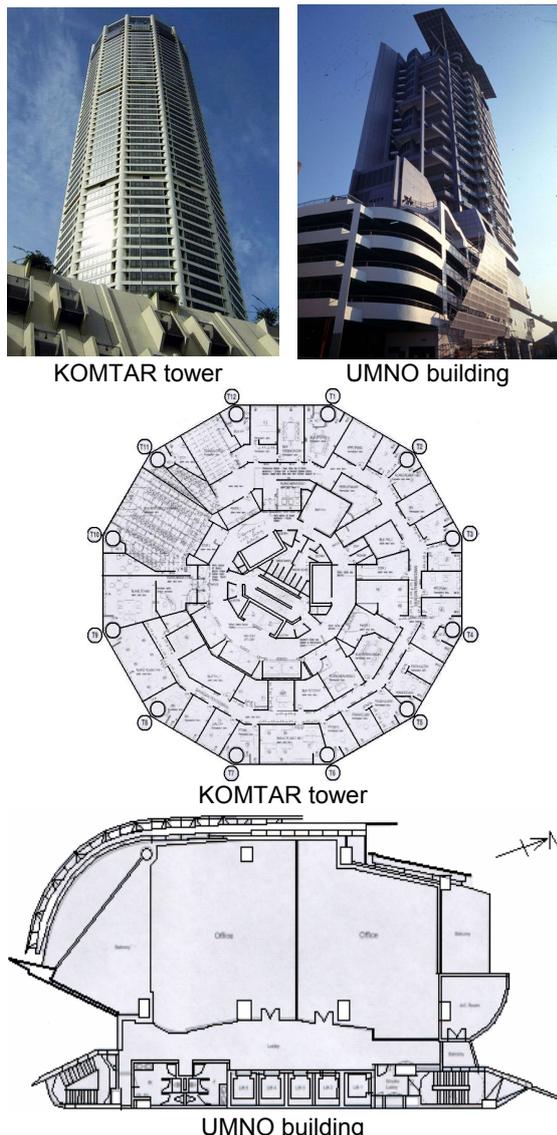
Image of the case study Buildings and typical layout plan of the buildings
